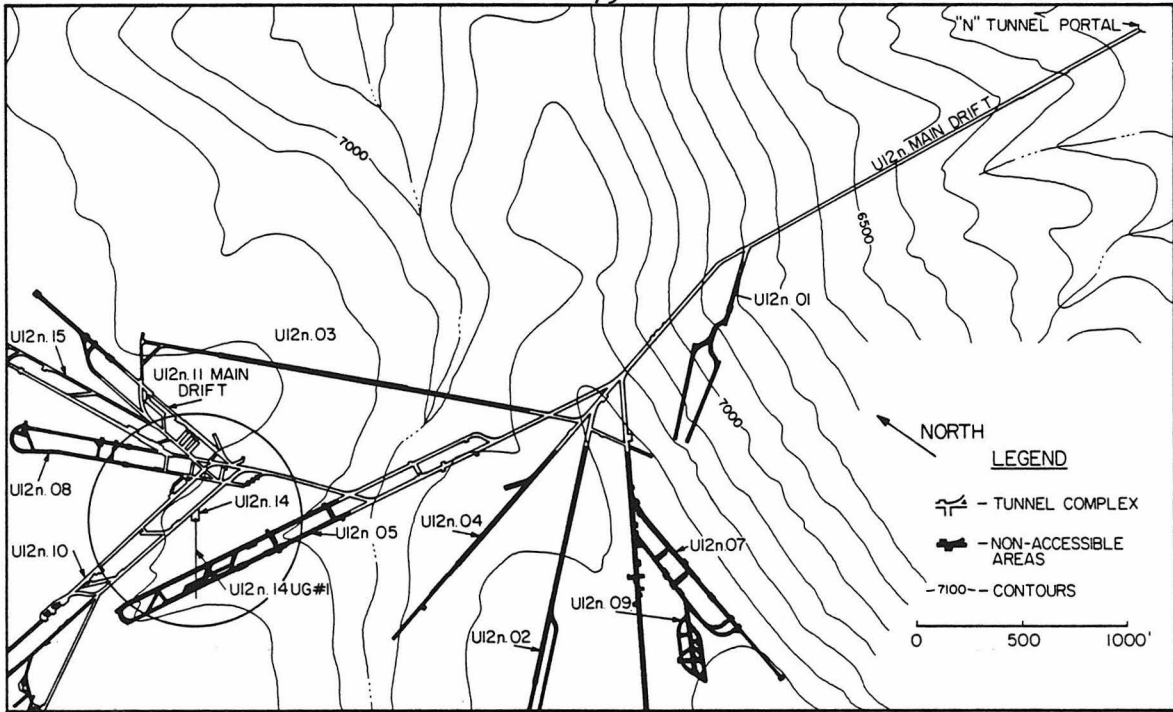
Plan view of n-tunnel excavations and the experiment site in UI2n.14UG-1.
